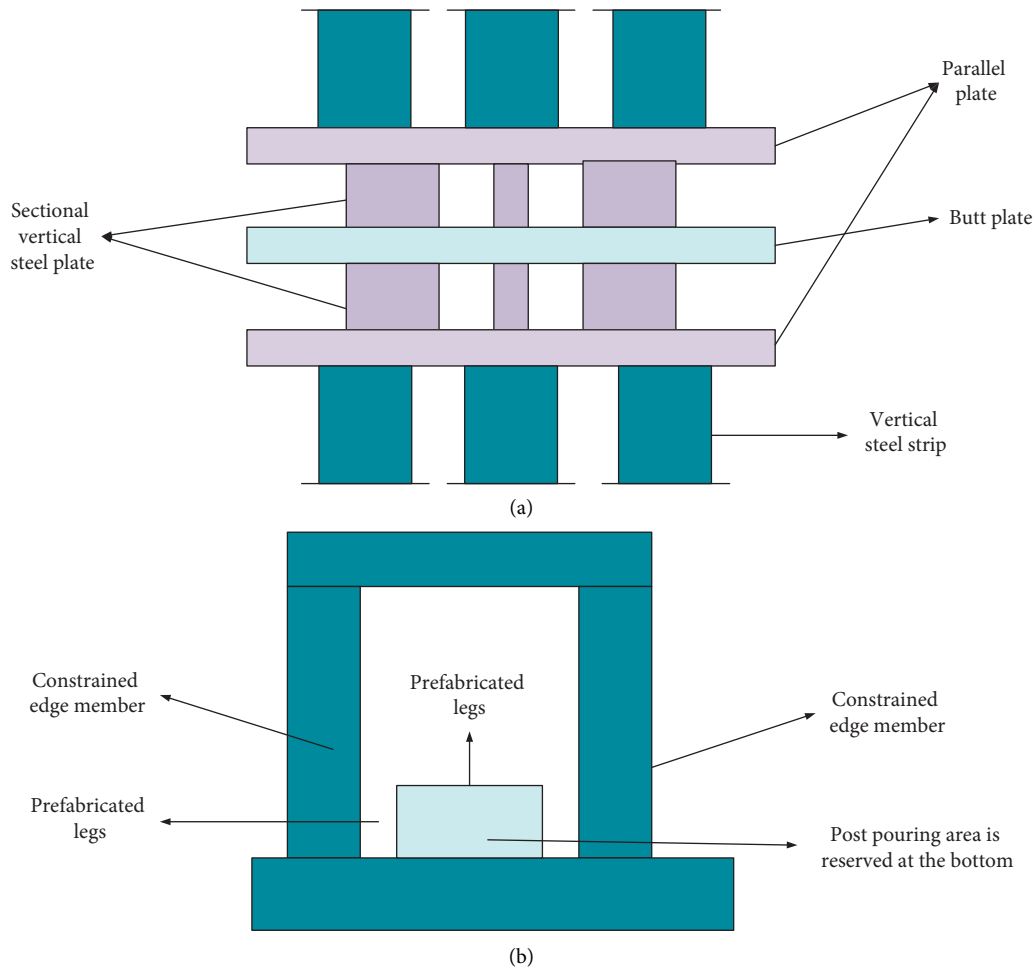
Shear wall horizontal joint structure: (a) shear wall of steel plate strip concrete and (b) prefabricated shear wall with reserved postcast area at the bottom.
